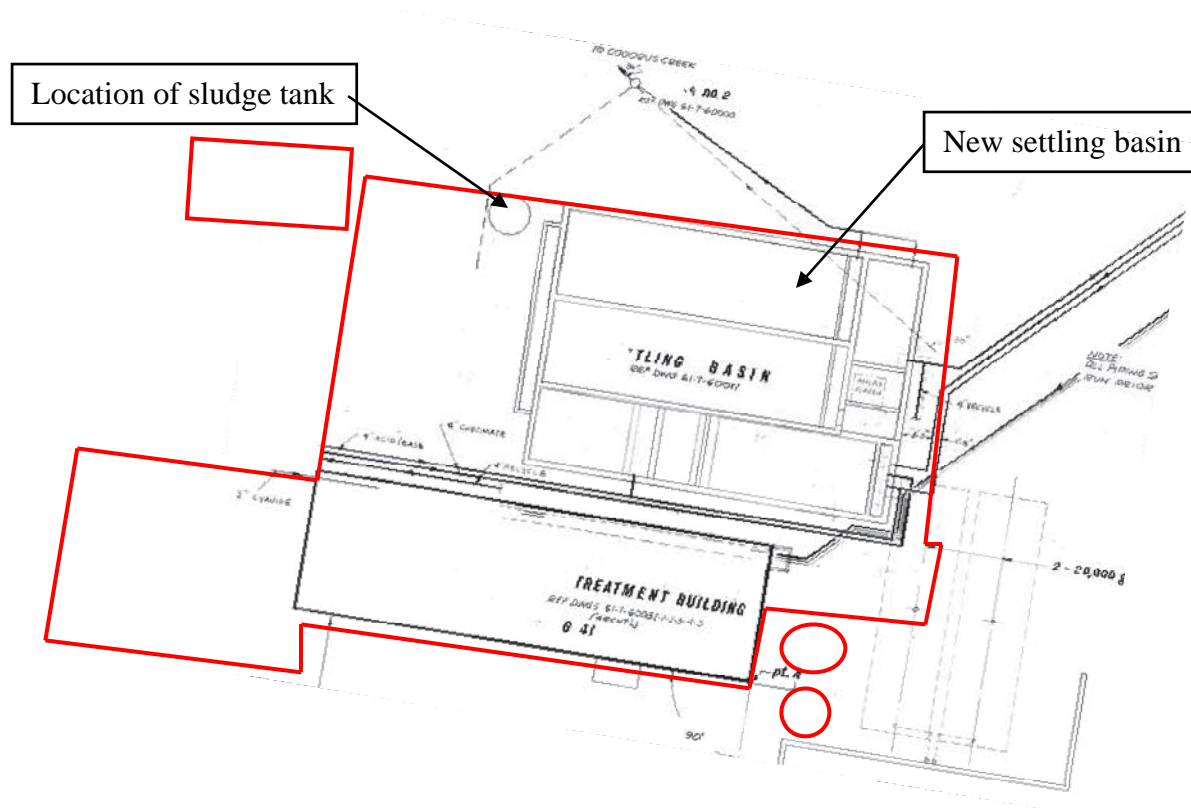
December 5, 1967 AMF drawing No. 61-7-60000 (Proposed New Waste Treatment Building 41 - east orientation). Note location of original Building 41 structure and outdoor treatment tanks. Sumps located on the northeast and northwest corners of the building connected to piping from Building 2 & 4 wastewater tanks, respectively. Also note discharge to stormwater manhole from northeast corner of lone settling basin. Obscured note on this drawing indicated that the settling basin measured 54' long by 14' wide; the EQ tank measured 20'L x 12'W; and the sumps each measured 4' x 4'.
